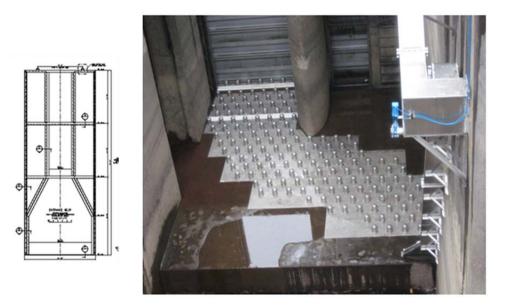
Variable-width entrance weir (line drawing, left) and Bonneville Dam Cascades Island entrance during installation of bollards, Lamprey Passage System (LPS, ascending wall to right in photo), and Half-Duplex PIT antennas (white bars spanning opening near entrance bulk head). The variable-width weir was installed to the entrance slot in spring 2009.
